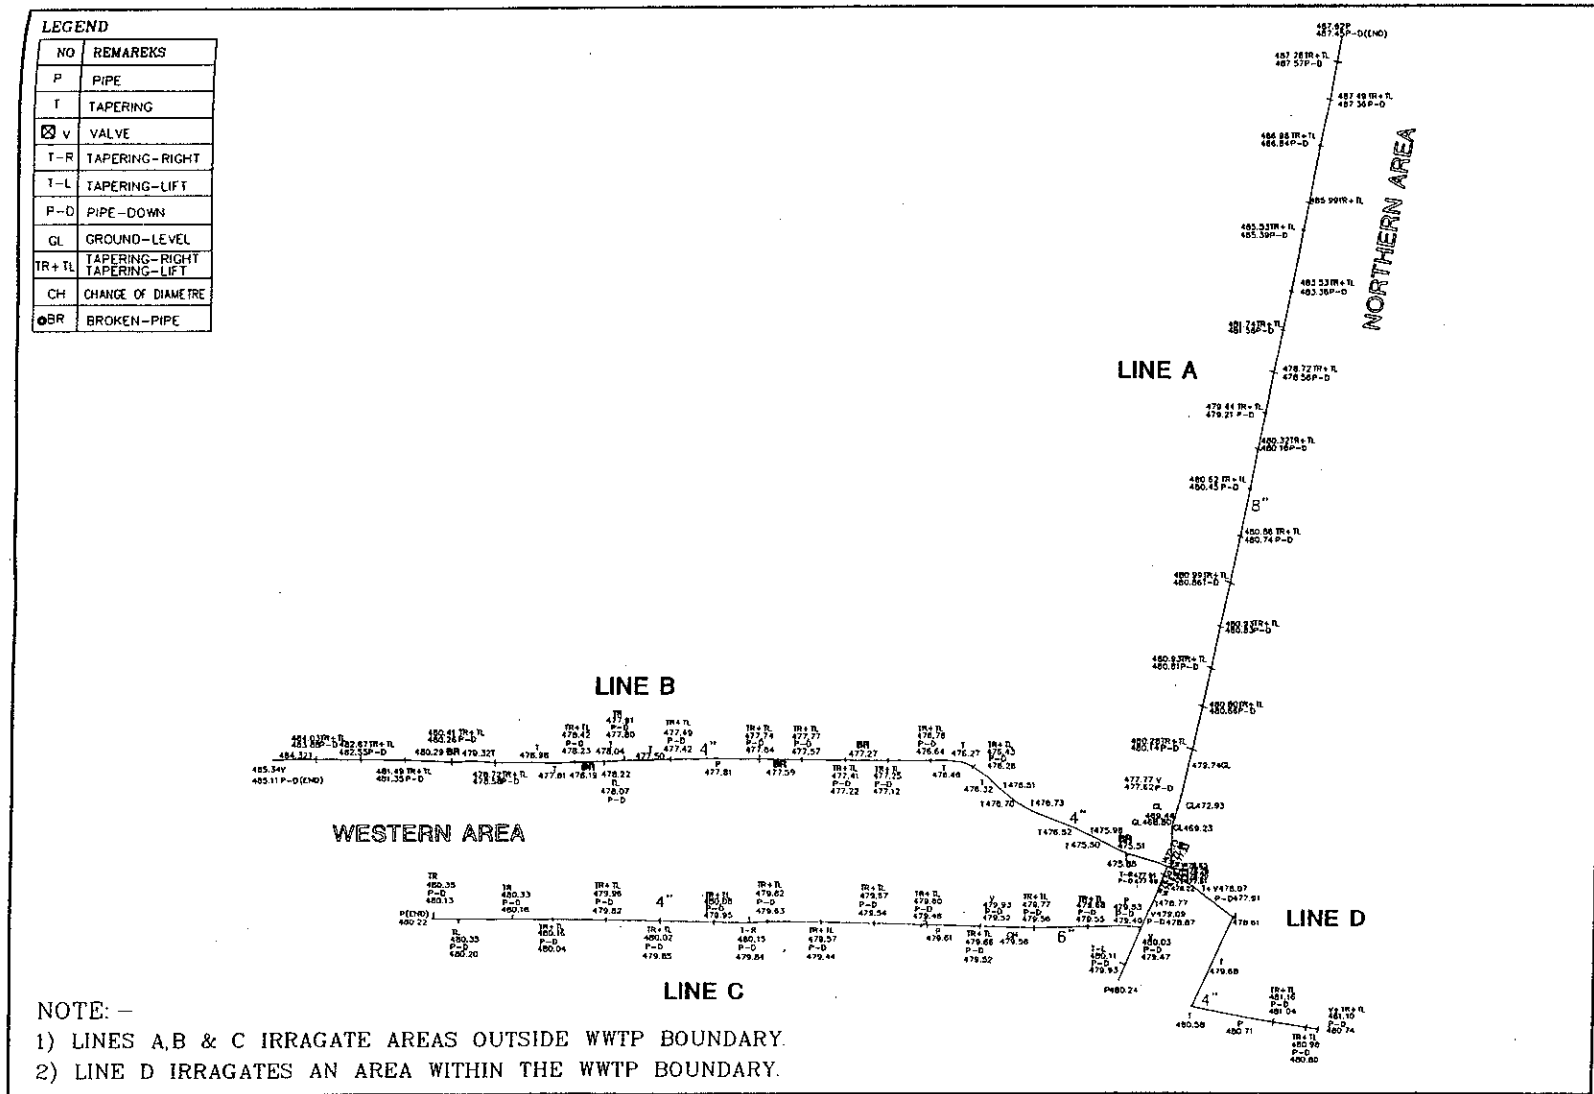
Existing Reuse System - RAMTHA (Schematic Layout)
